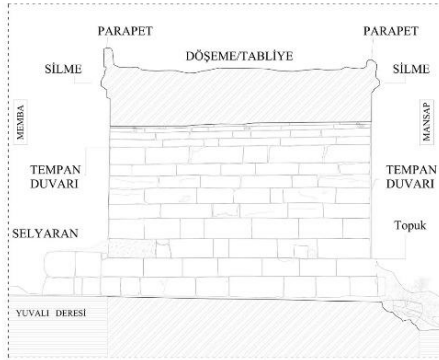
The architectural details of Büyükkarıştıran Bridge (Ayberkin, 2018).
